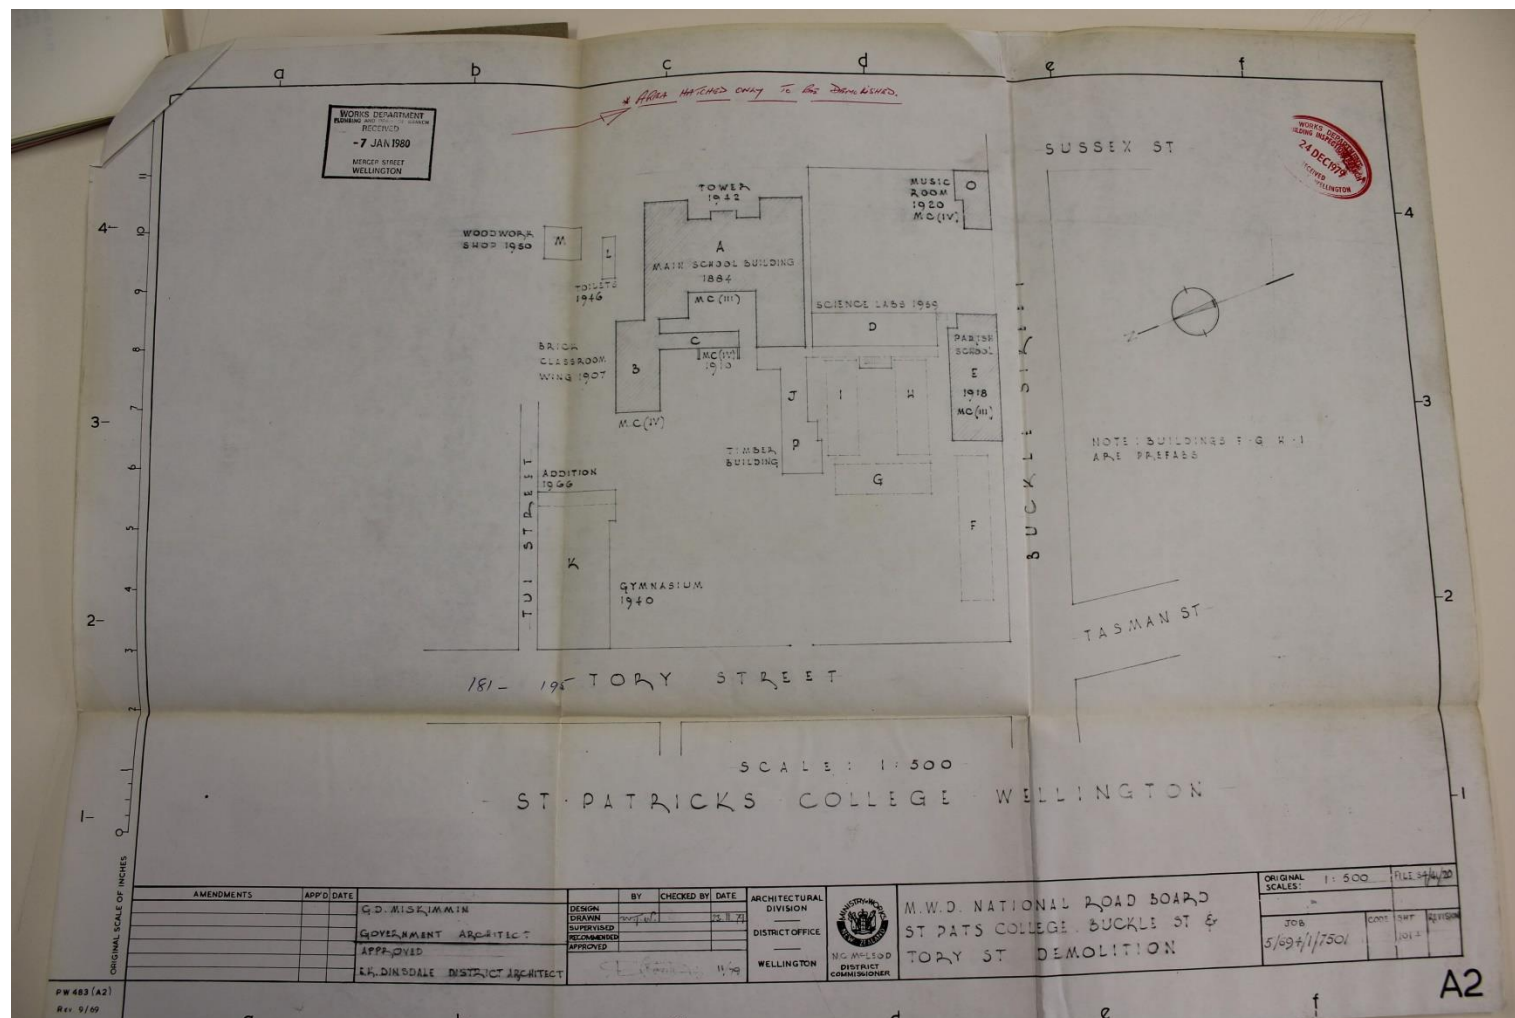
Plan of St Patrick's College, dated 1979, showing layout of school buildings over Town Acres 256, 257, and part of 258. Source: 'Demolish St Patrick's College', 00058:1247:C53087, Wellington City Archives
